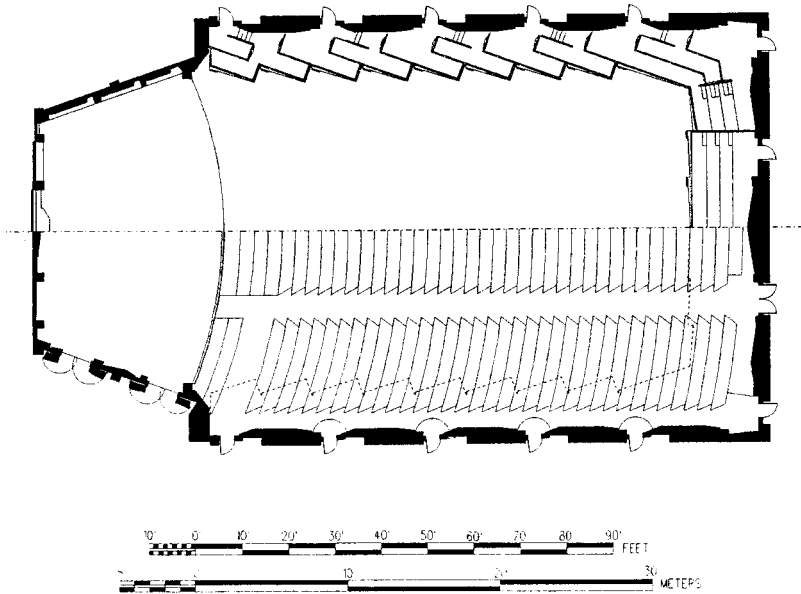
Plan of Benaroya Hall showing the seating at orchestra and balcony levels.
